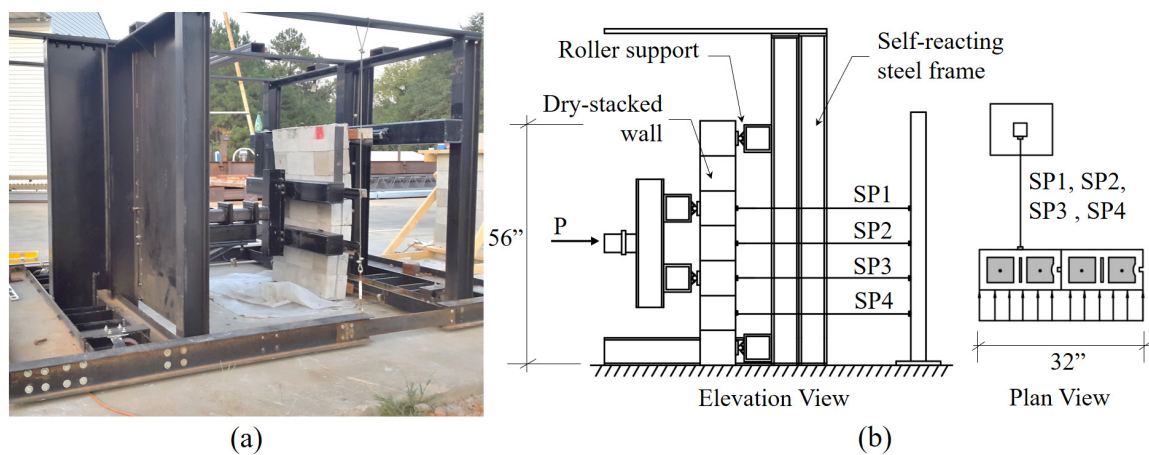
Representative dry-stacked wall test setup, (a) photo taken during experiments and (b) elevation view and plan view.
